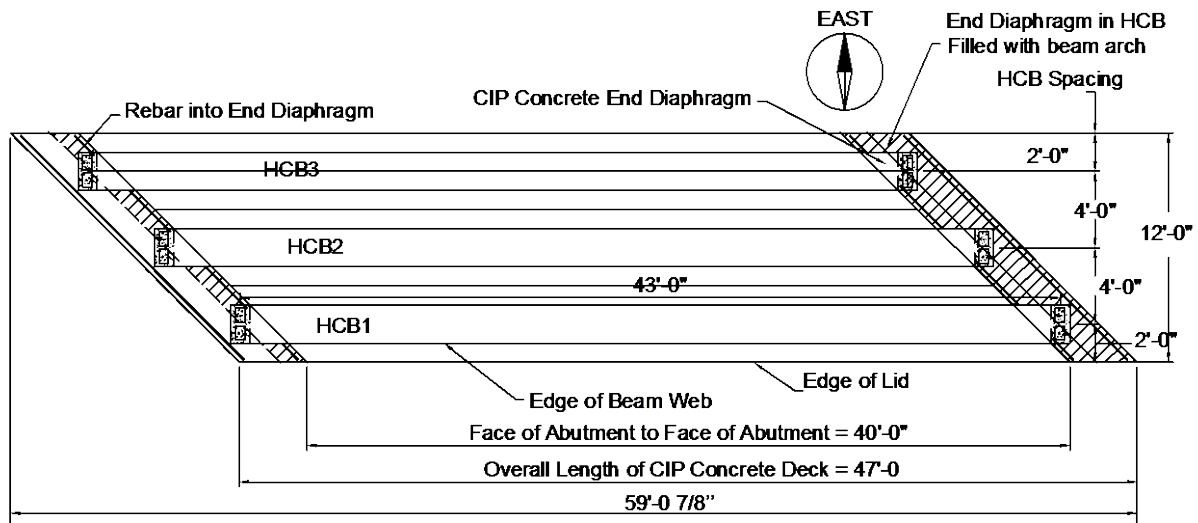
Plan Drawing for HCB System Tested at Virginia Tech
